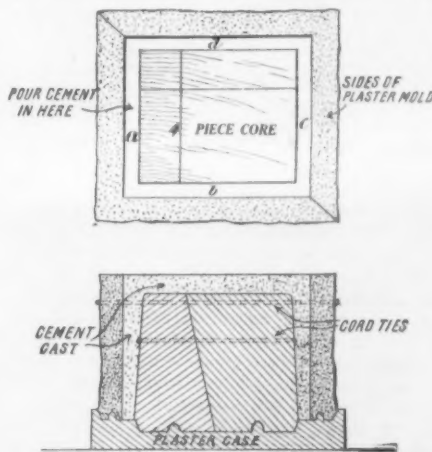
PLASTER MOLD SET UP FOR CASTING CEMENT.
